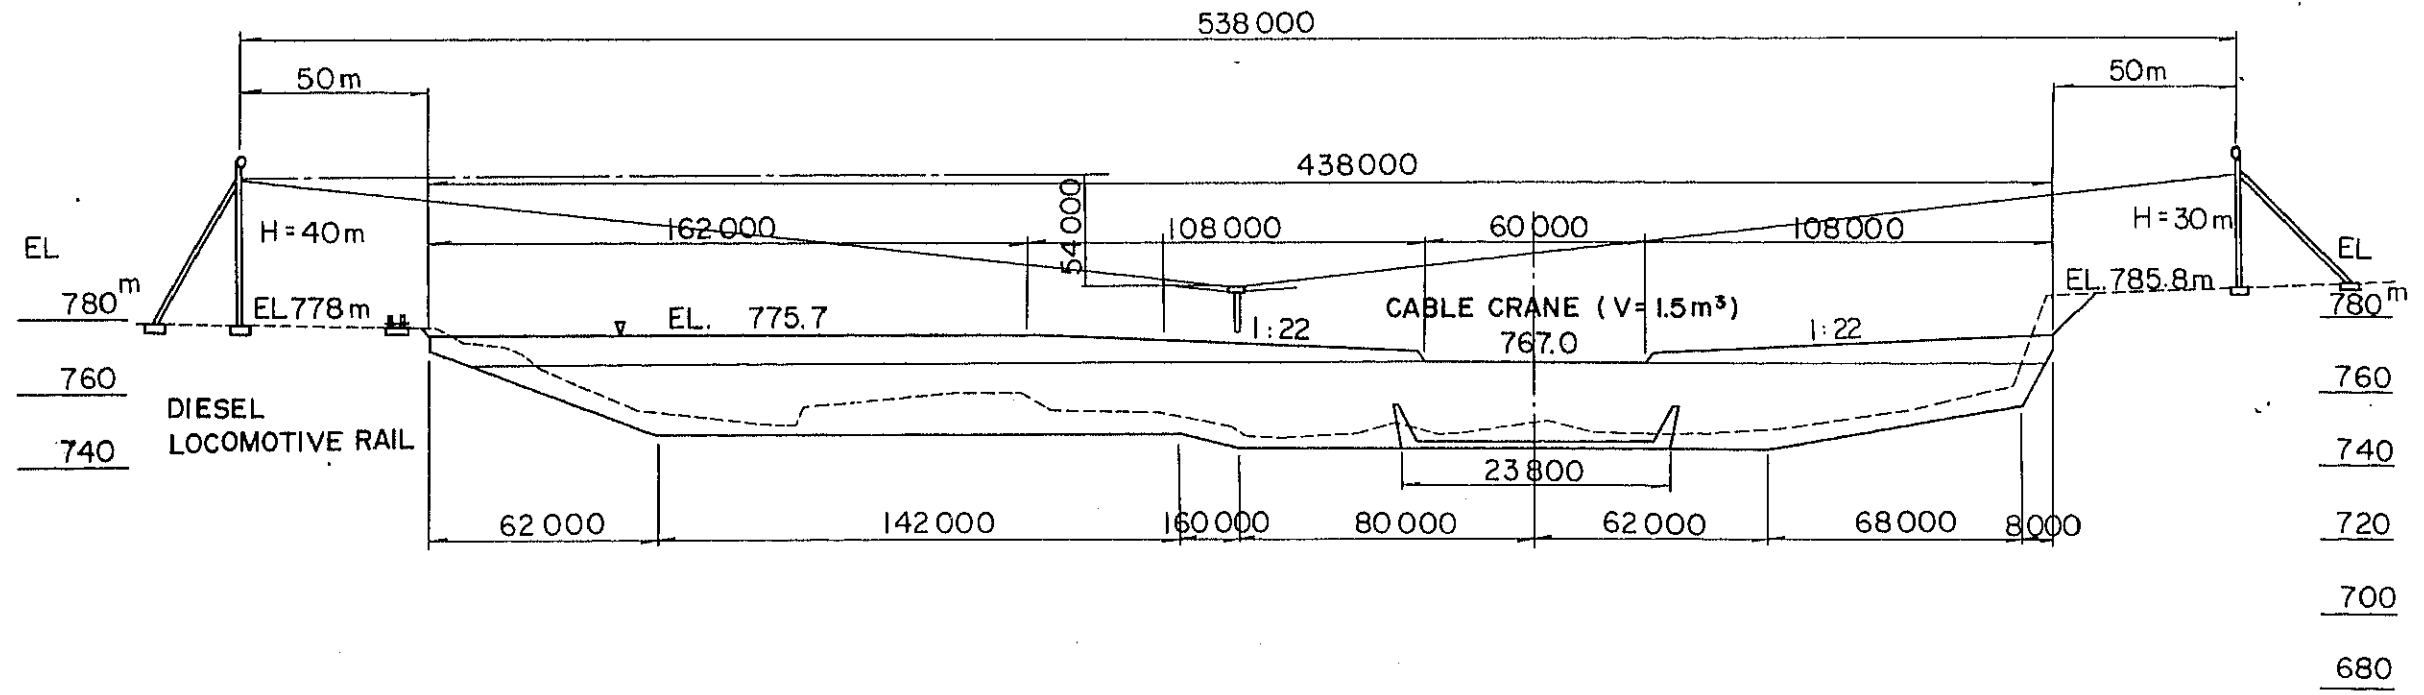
Cable crane at the BS.Kobóán check dam-6 site
